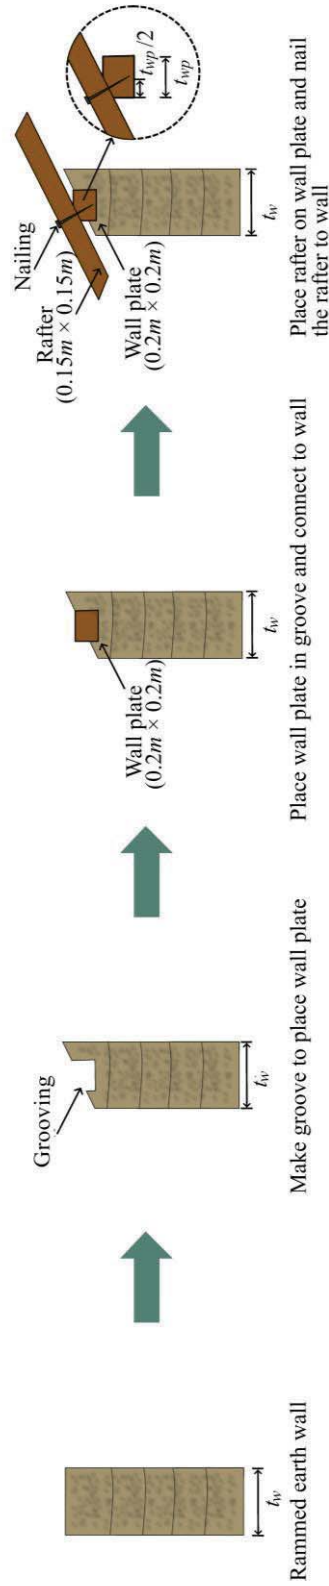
Wall plate-to-wall connections in new rammed earth buildings
